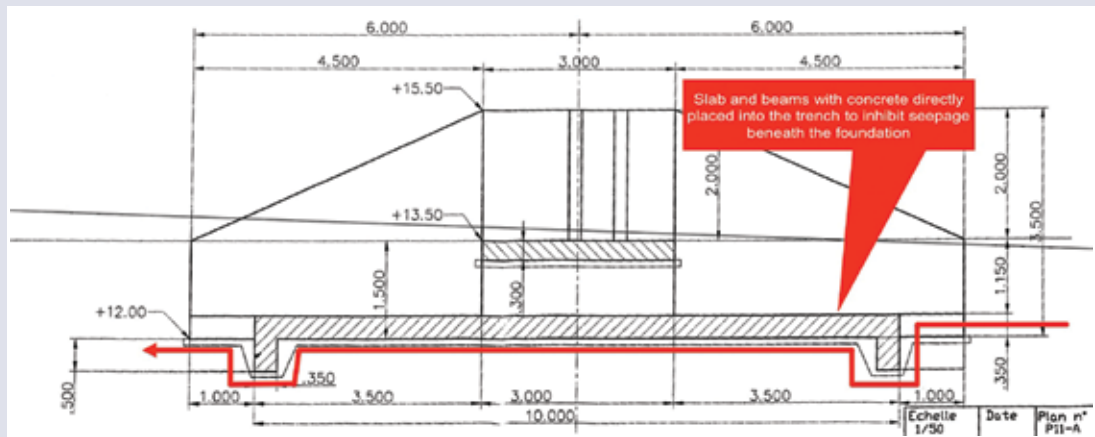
Use of concrete beams to act as cut-offs to reduce seepage (courtesy Thibaut Mallet)
